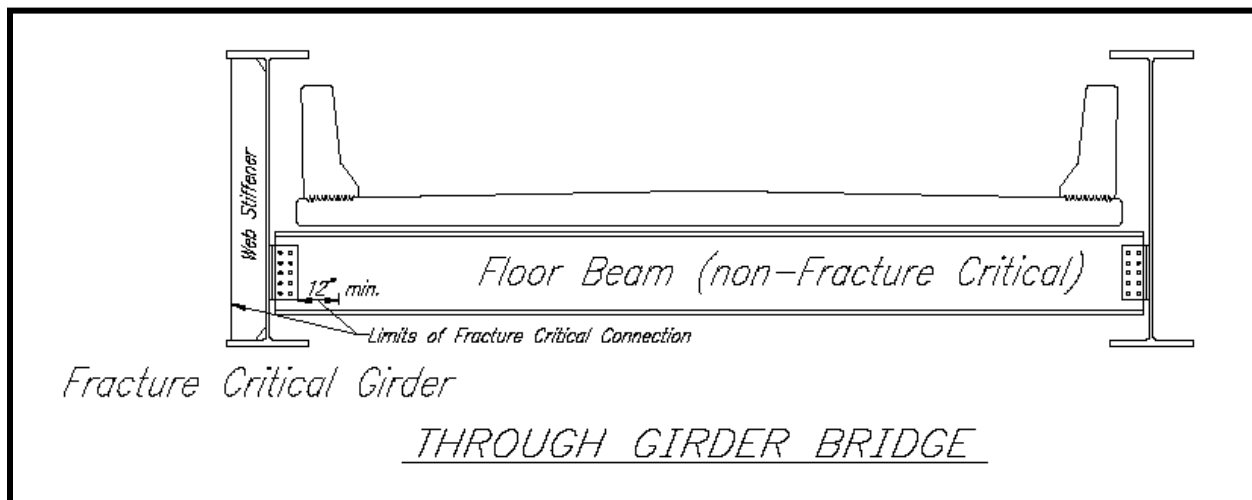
4-3: Fracture Critical Connection at Through Girder
